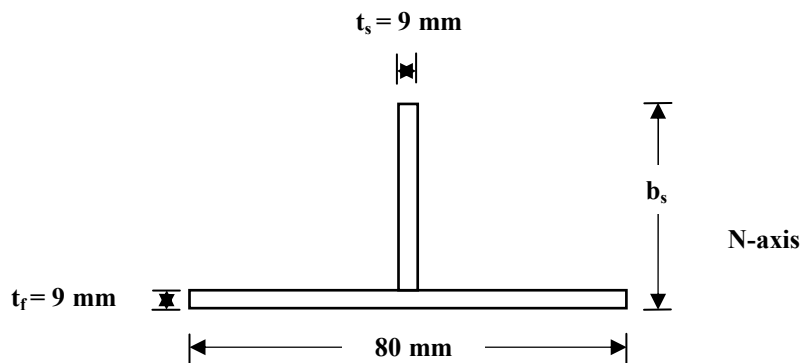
Required cross-section of diagonal stiffeners for specimen OB3
